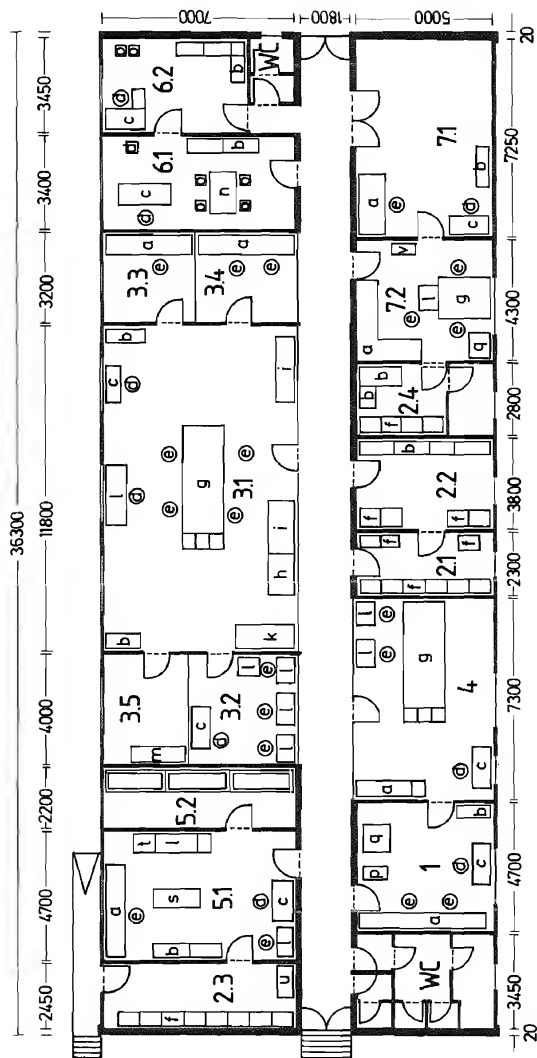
Proposal for the layout and equipment of a complete cement works laboratory
